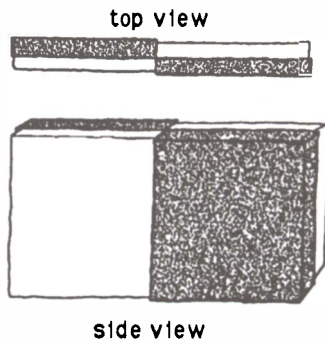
Schematic diagram of diagonal plastering of opposite sides of adobe test walls. The wall shown for the side view is one of the half walls.
